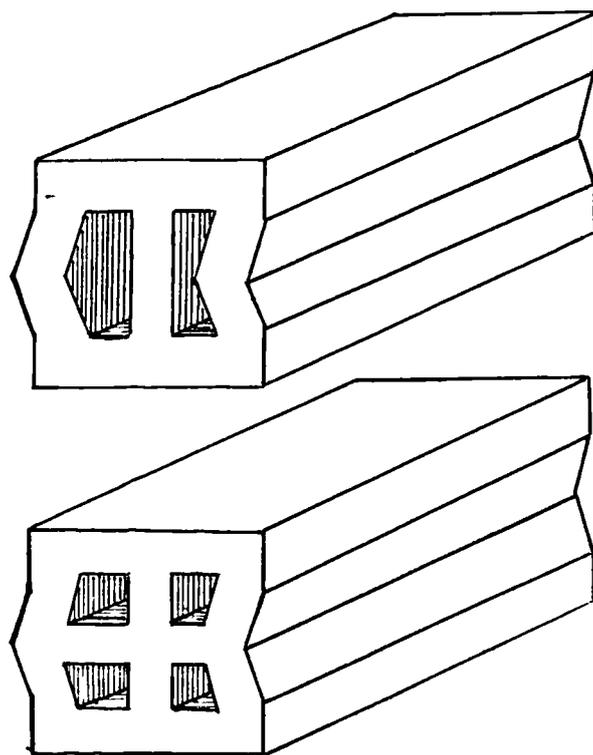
Benford Deacon's ventilating hollow bricks, British Patent No. 3664, 1813. [Adapted from The Building News (1858) p. 317]
